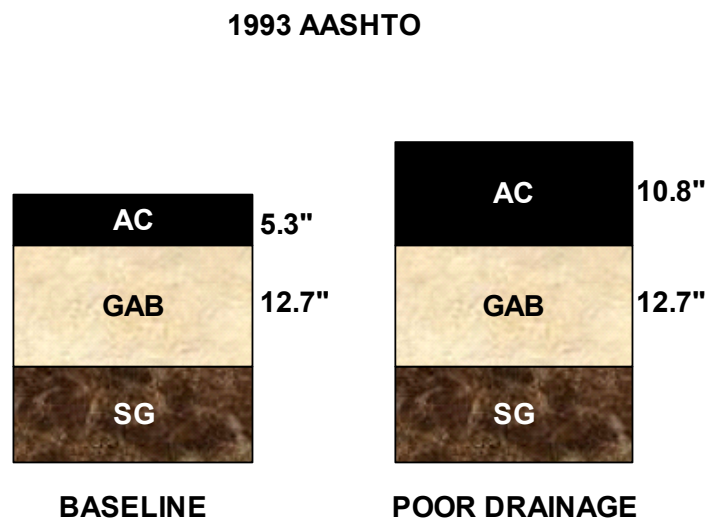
Summary of flexible pavement sections: poor drainage scenario.
